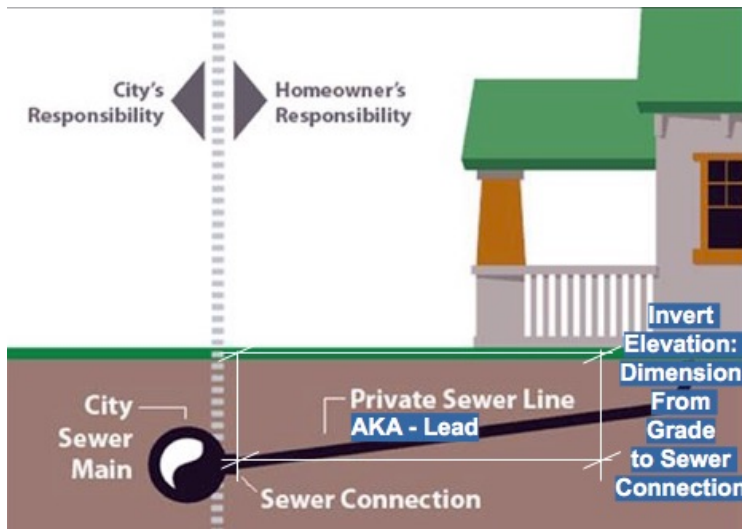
SEWER CONNECTION (AKA LEAD) AND INVERT ELEVATION DIAGRAM
